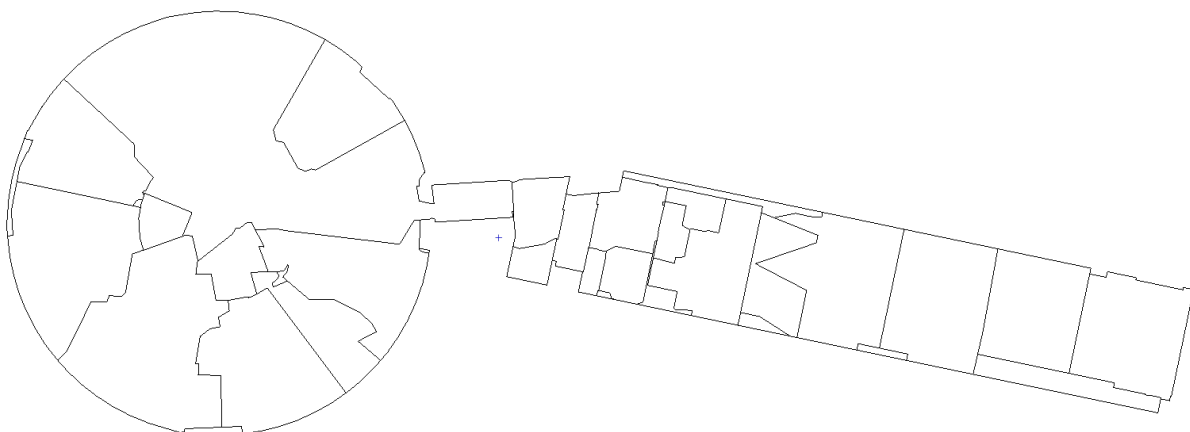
Plan view of 10mm voxel filter F2050 reconstruction using 26 ground floor scans w/ blinds down
